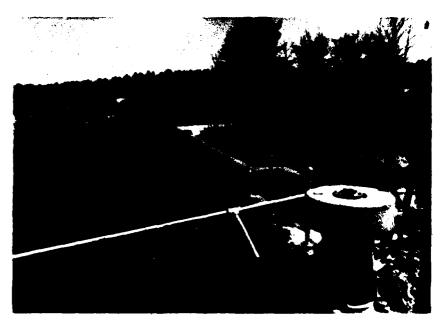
View of wall along left bank and portion of head gate structure.
